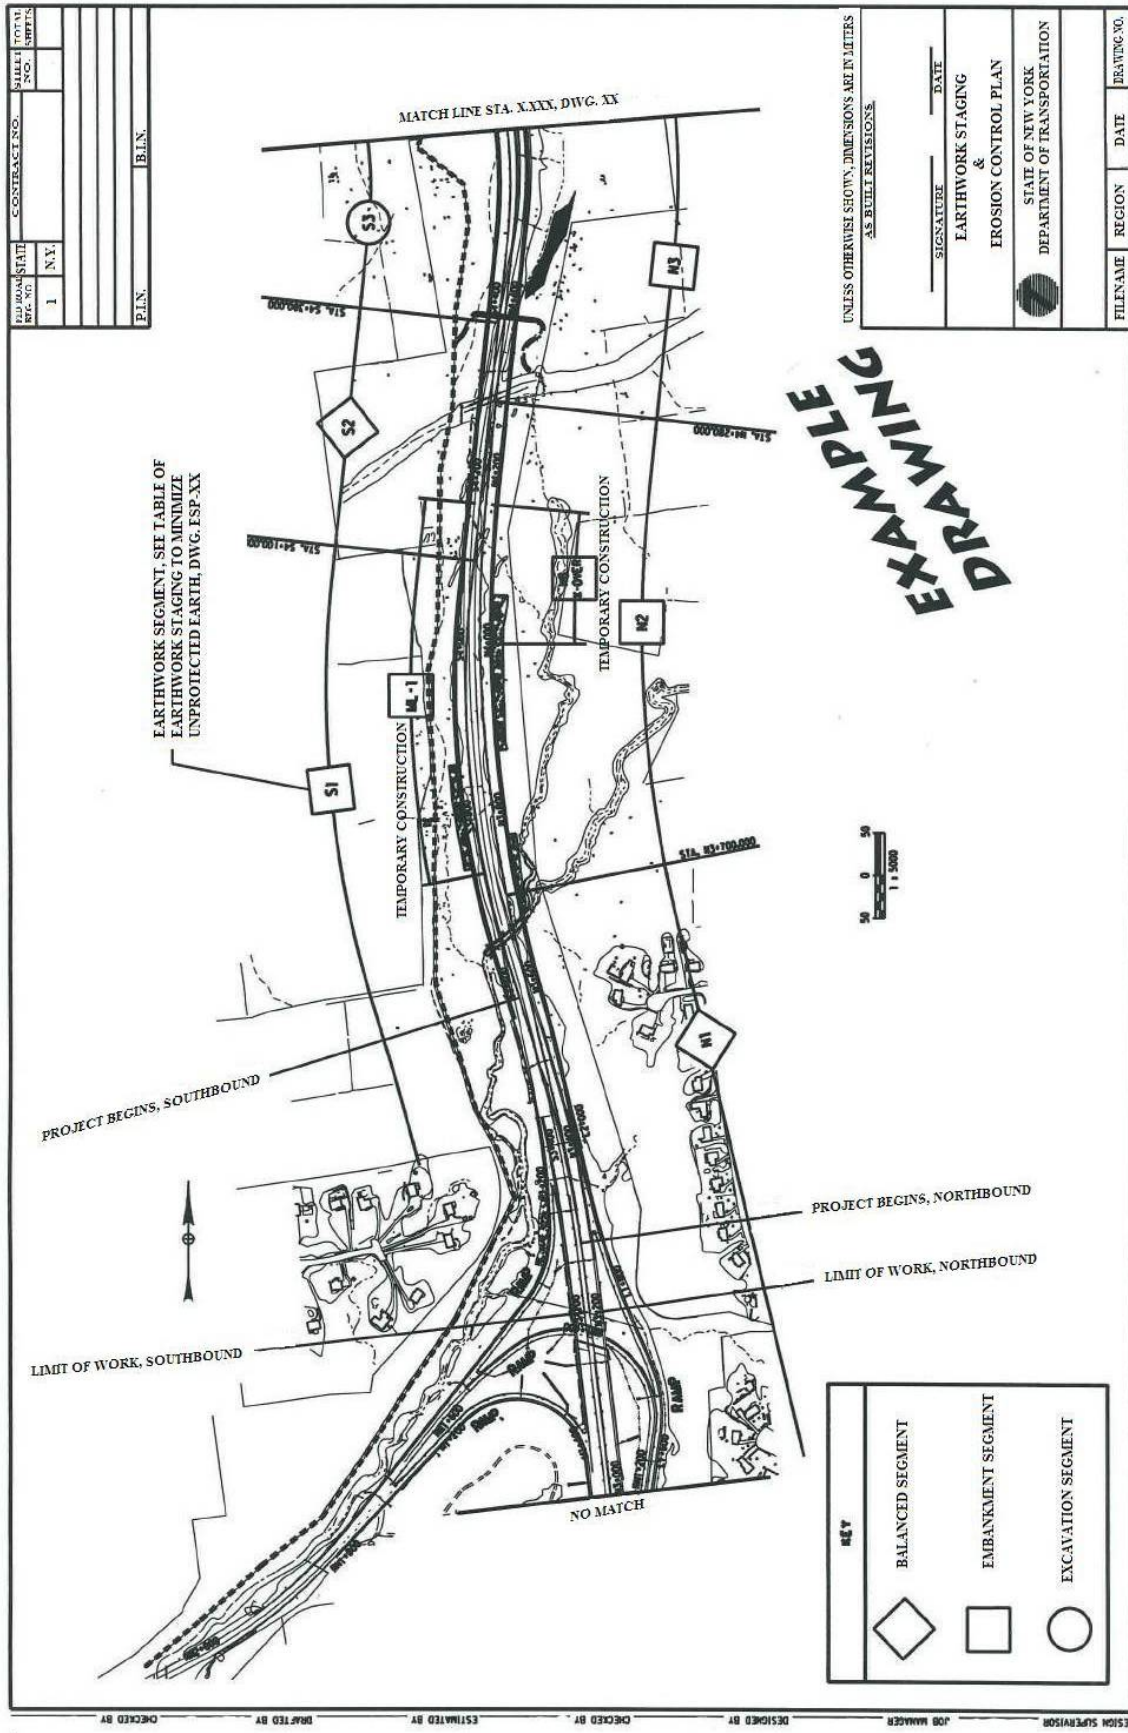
Example Earthwork Staging and Erosion Control Plan
